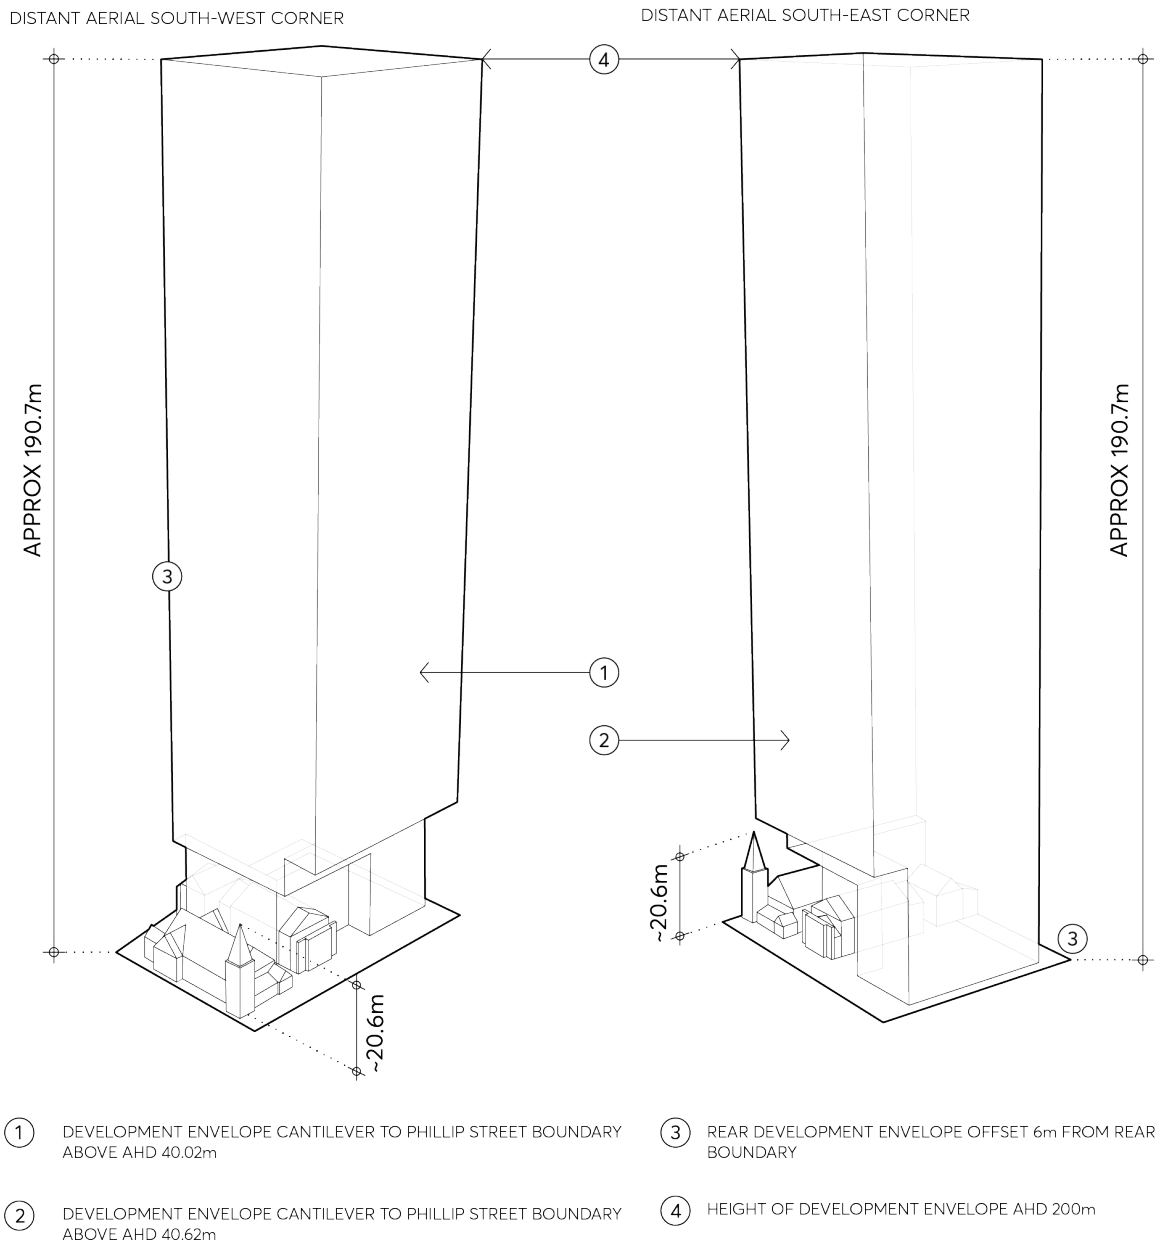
Maximum building envelope south west and south east corner elevations
